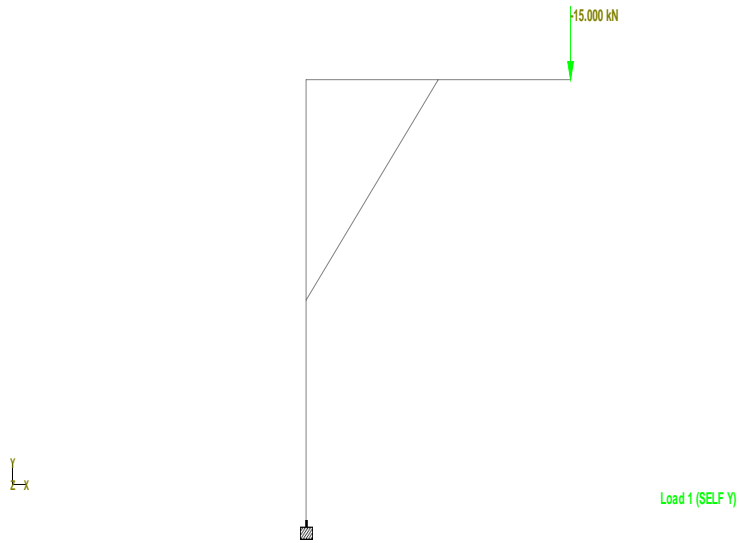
Specimen –A beam column joints for closed joints (In Staad)
